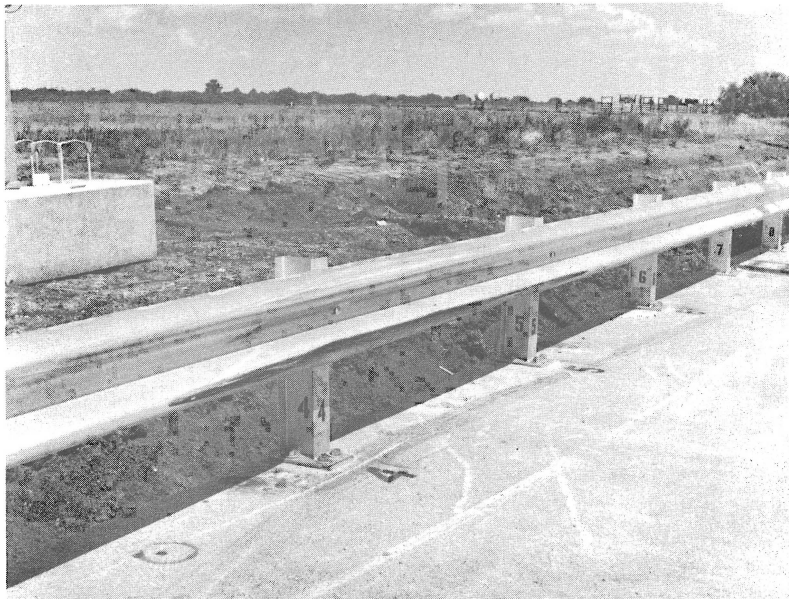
TUBULAR W-BEAM Bridge Rail after Crash Test 2.
